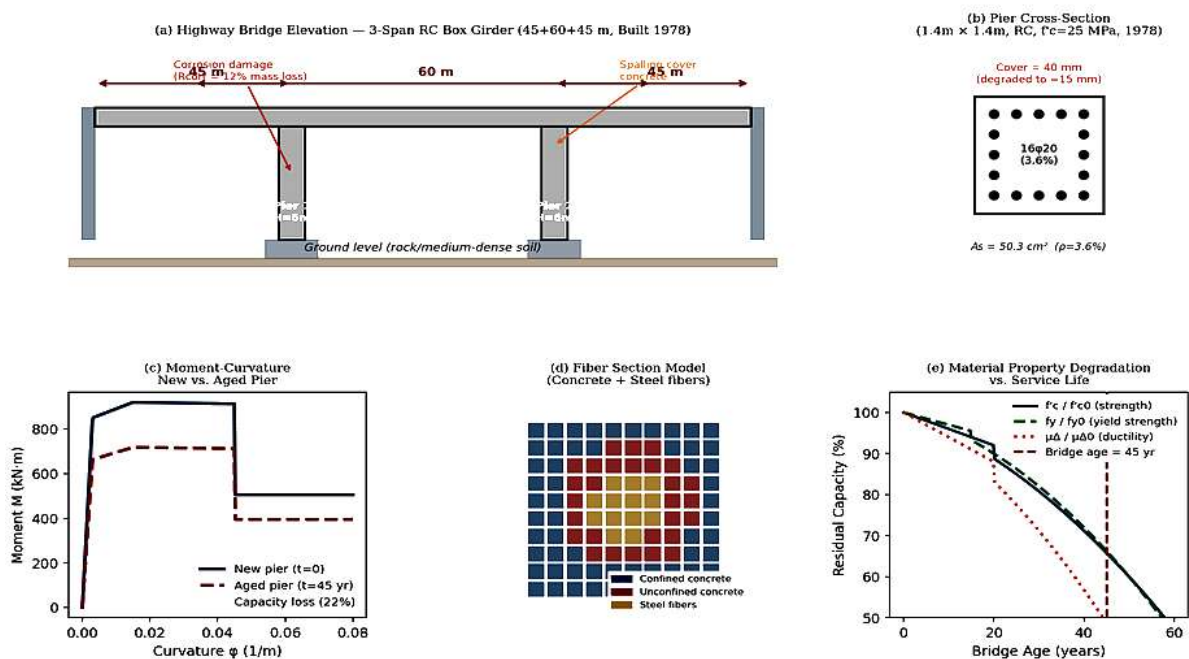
Bridge description — (a) elevation showing 3-span layout, pier dimensions, and aging defects (corrosion, spalling); (b) pier cross-section with 16 No. 20mm longitudinal bars; (c) moment-curvature diagrams comparing new and aged ( $t=45$ yr) pier; (d) fibre section discretisation for nonlinear FEA; (e) material property degradation curves vs. service life
